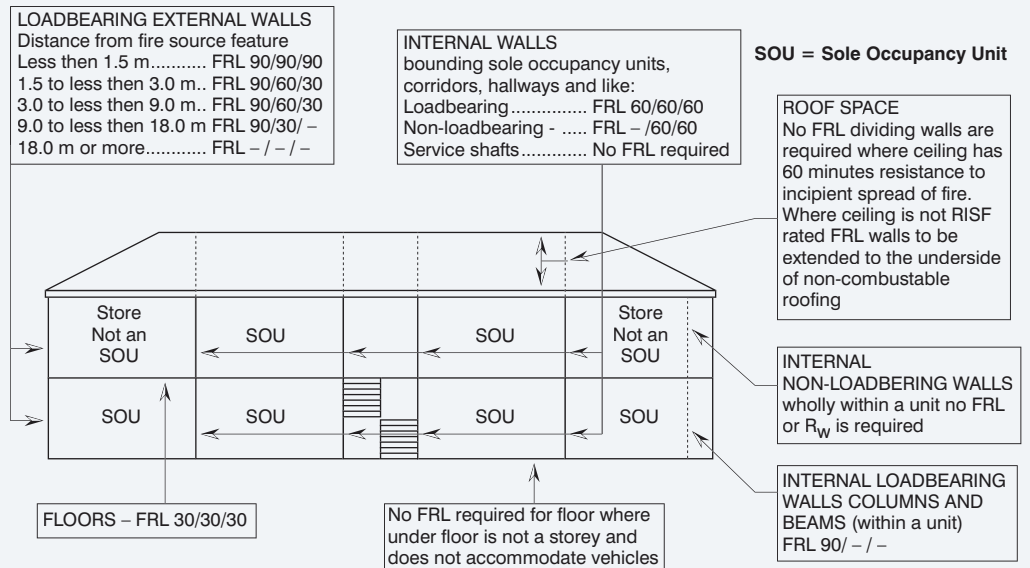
Type B Construction Deemed to Satisfy Requirements – without sprinklers (must have smoke alarms).
